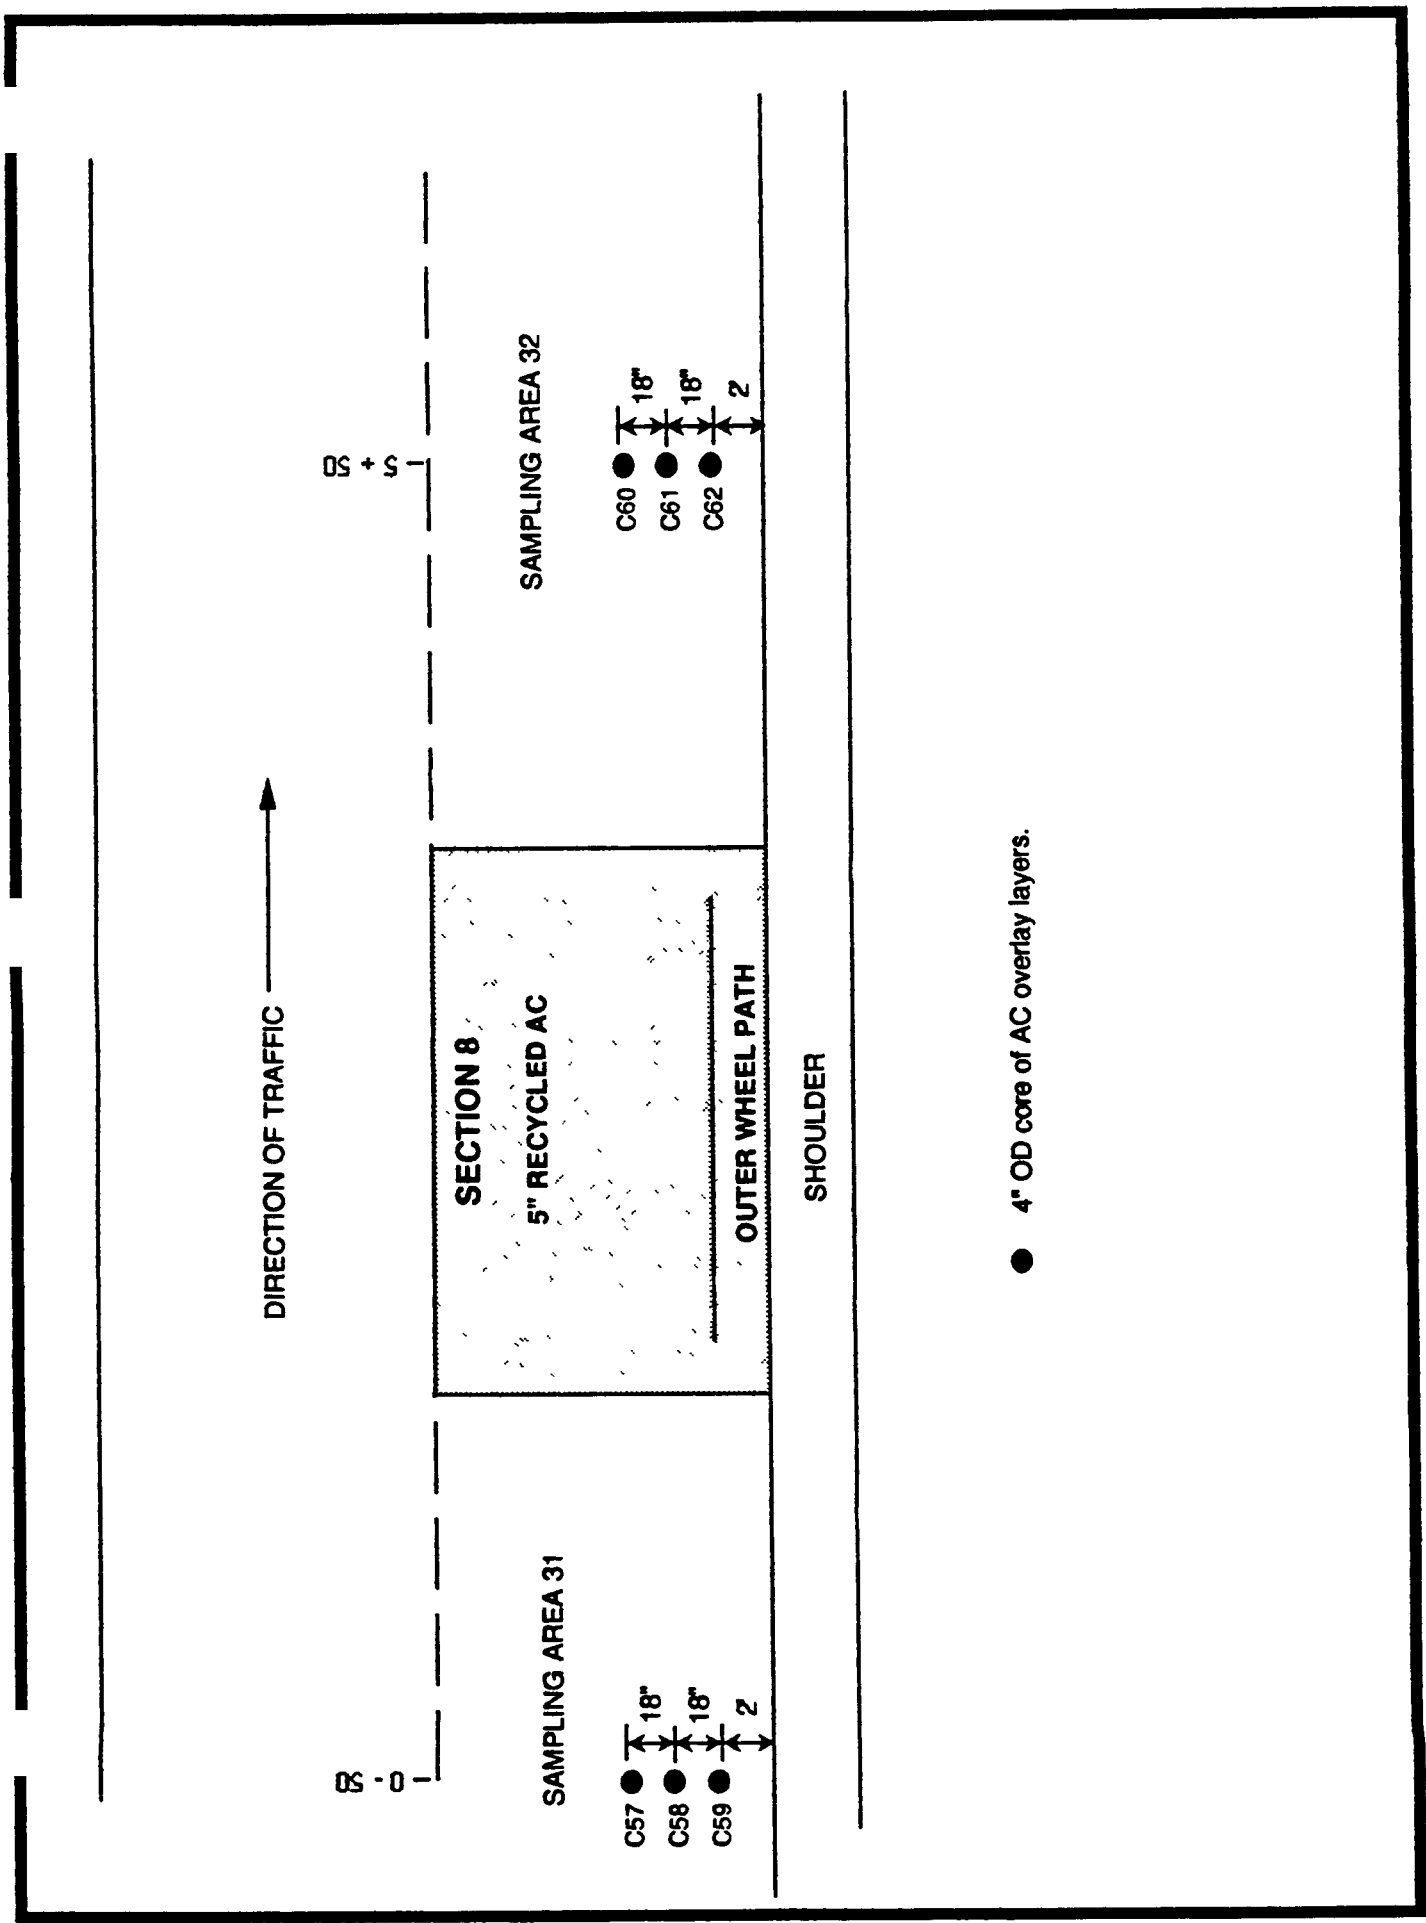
Example of "Post-Construction" Sampling Plan for Section 8.
